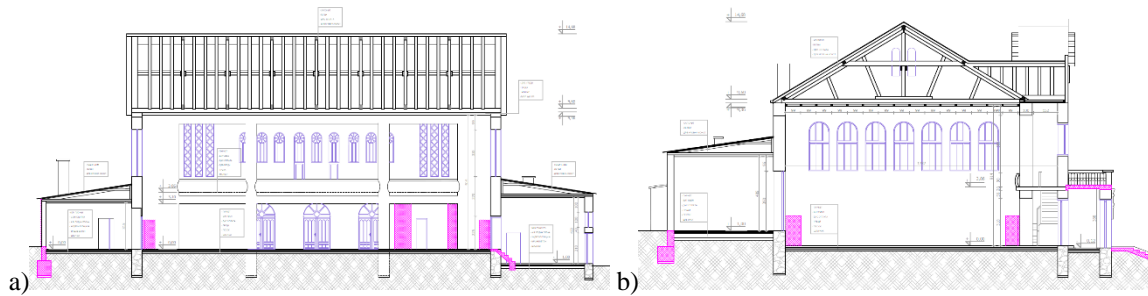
a) Longitudinal cross section of the building, c) Transverse cross section of the building
